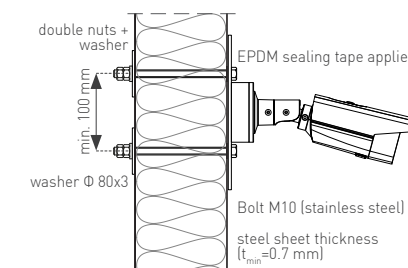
Fastening through the panel with M10 bolts (stainless steel).
